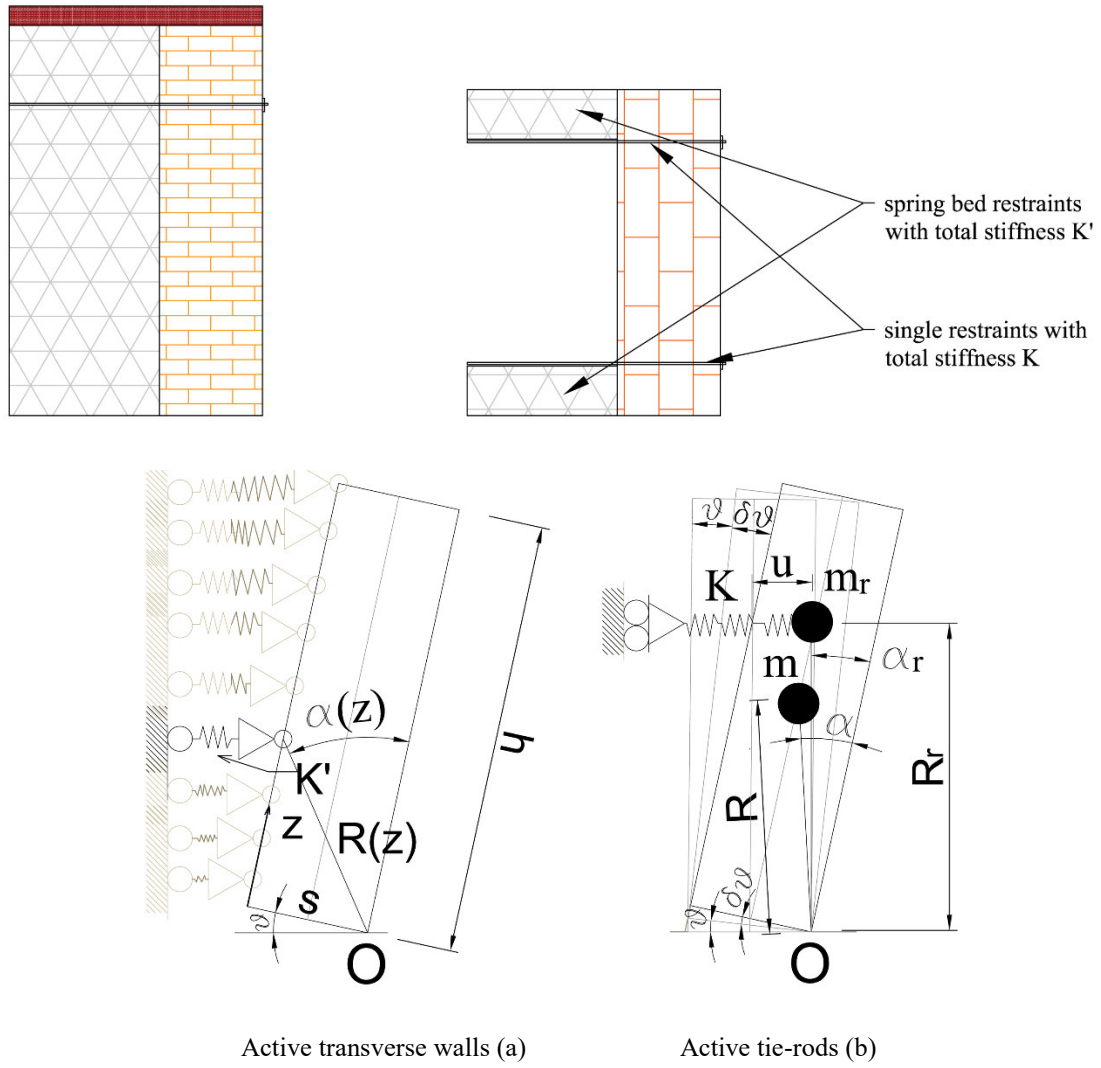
Housner block simulating a masonry wall with transverse walls (a) and steel tie-rods (b). The two structural elements are modeled with closely spaced independent flexible supports smeared out through the depth of the block (a) and single spring with the radius vector βR (b).
